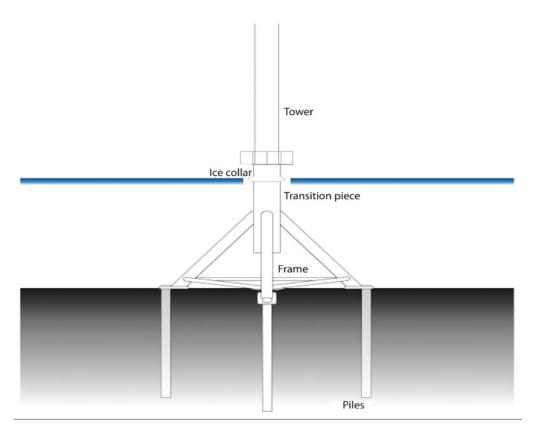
A schematic outline of a steel tripod foundation. The scale is not proportional; for details and dimensions see section 2.3.
